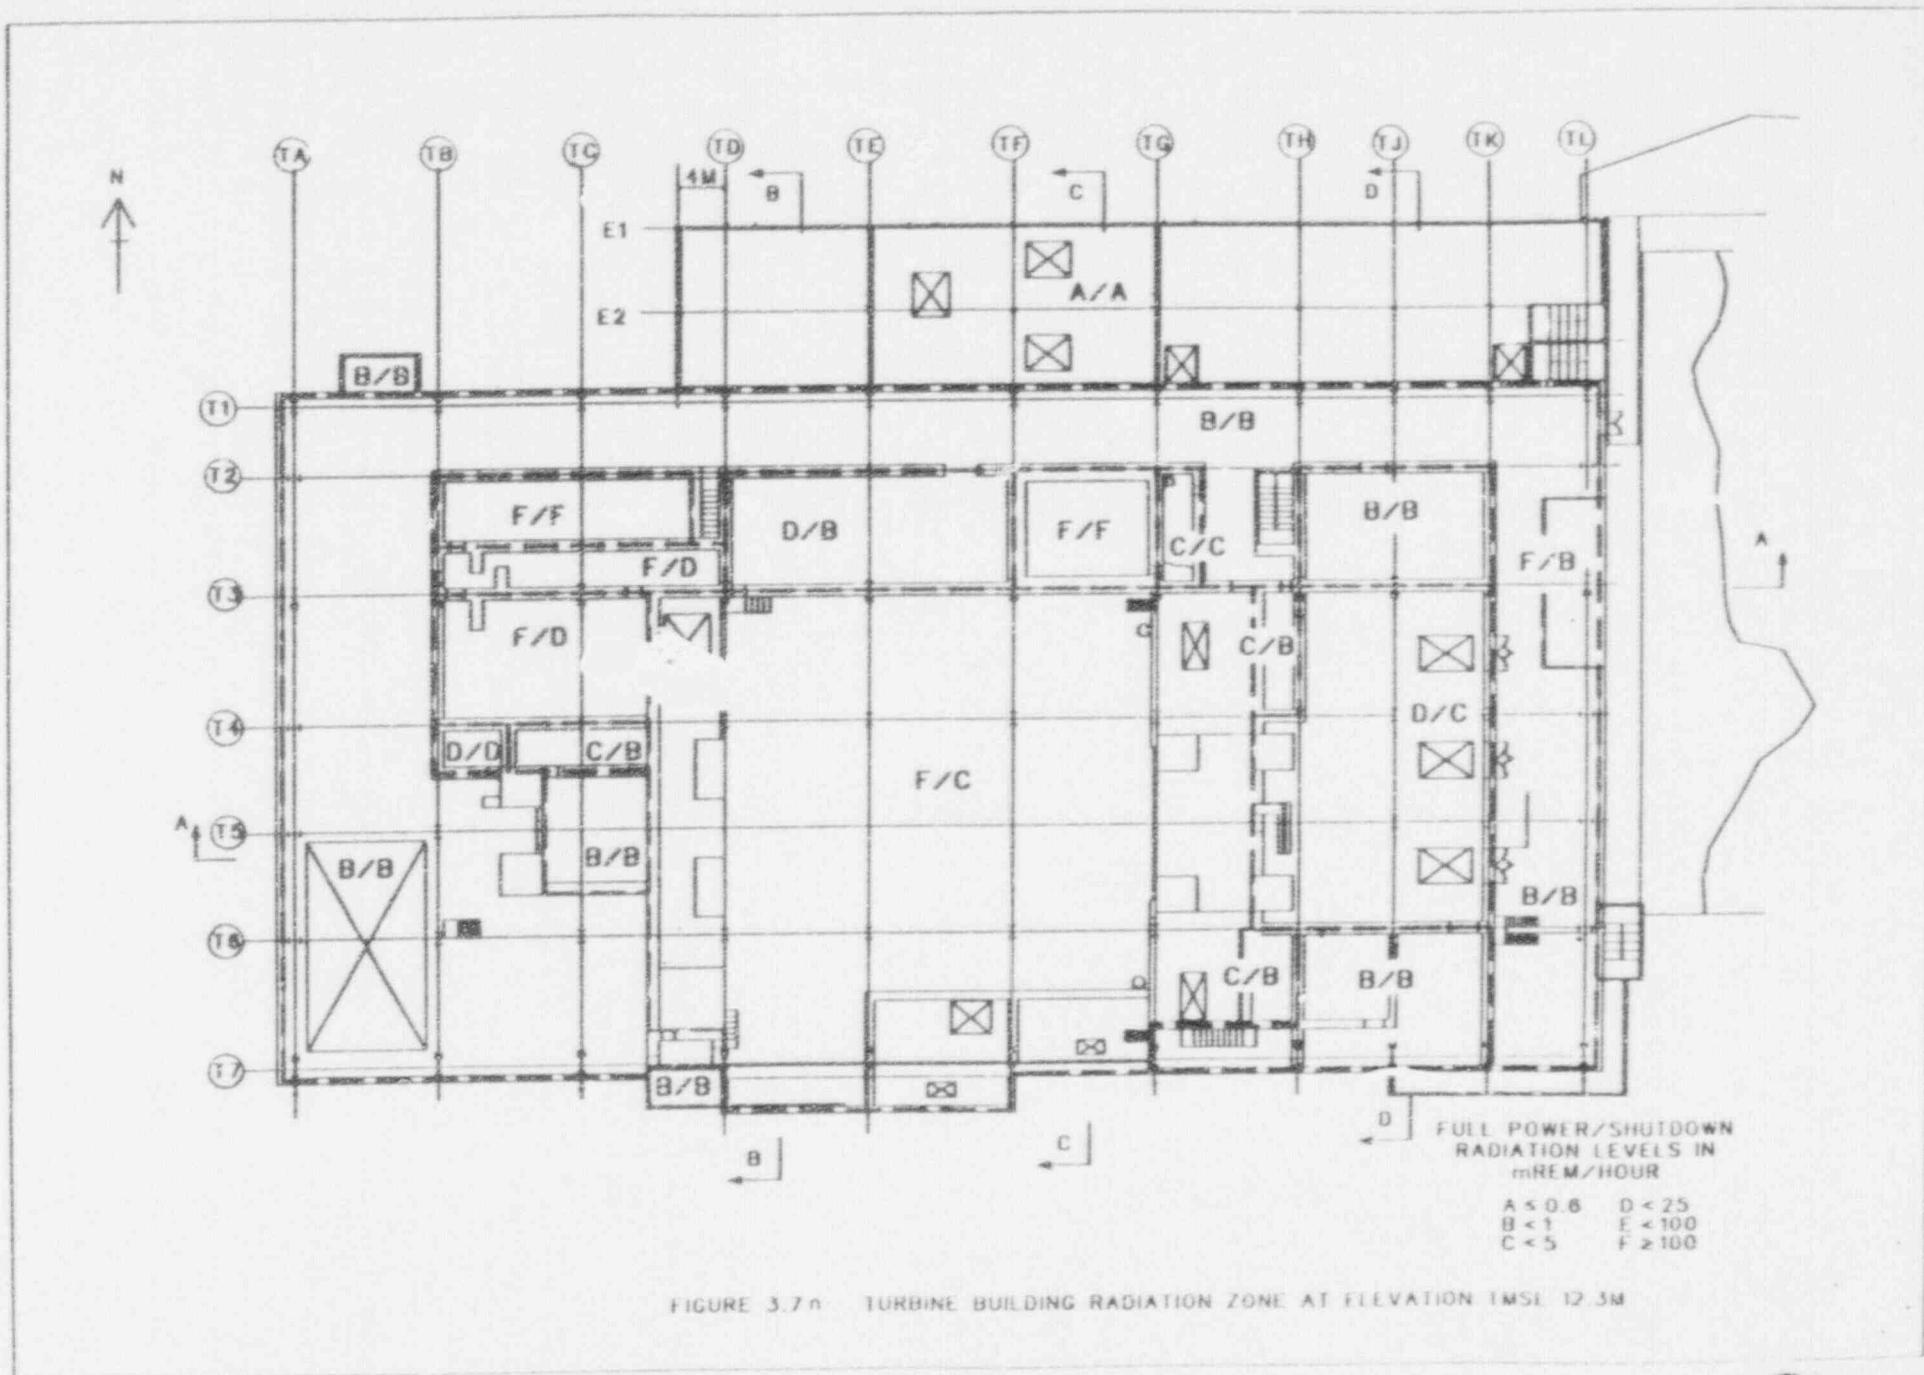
TURBINE BUILDING RADIATION ZONE AT ELEVATION 1MSE 12.3M
